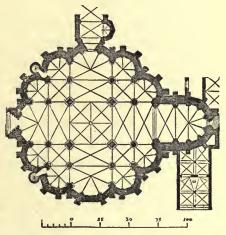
Trier or Trèves, Prussia: Church of Our Lady. Built 1227 to 1243 A.D. Plan.
